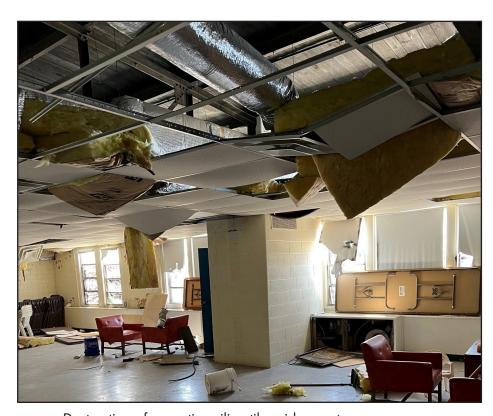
Destruction of acoustic ceiling tile grid over stage.
